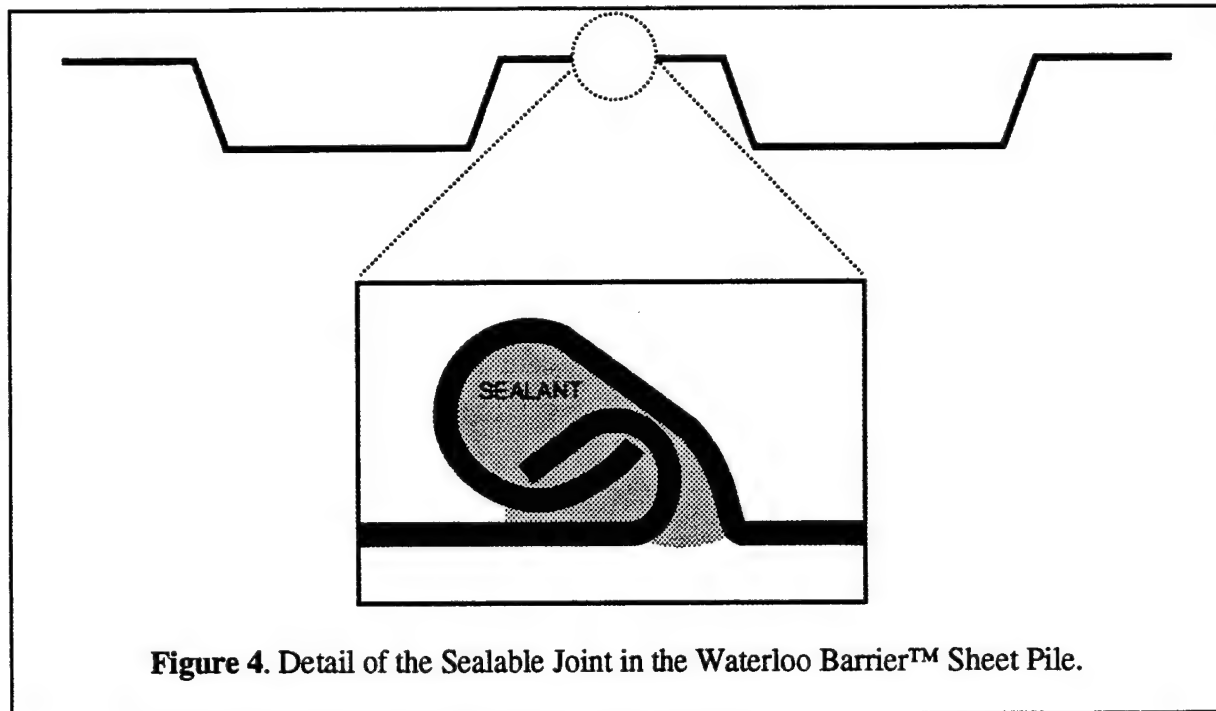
Detail of the Sealable Joint in the Waterloo Barrier™ Sheet Pile.
